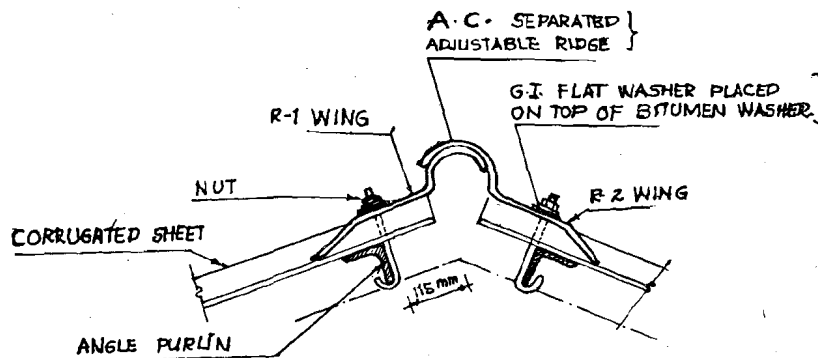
Typical Details of Adjustable Ridger at the Ridge Line of Truss
